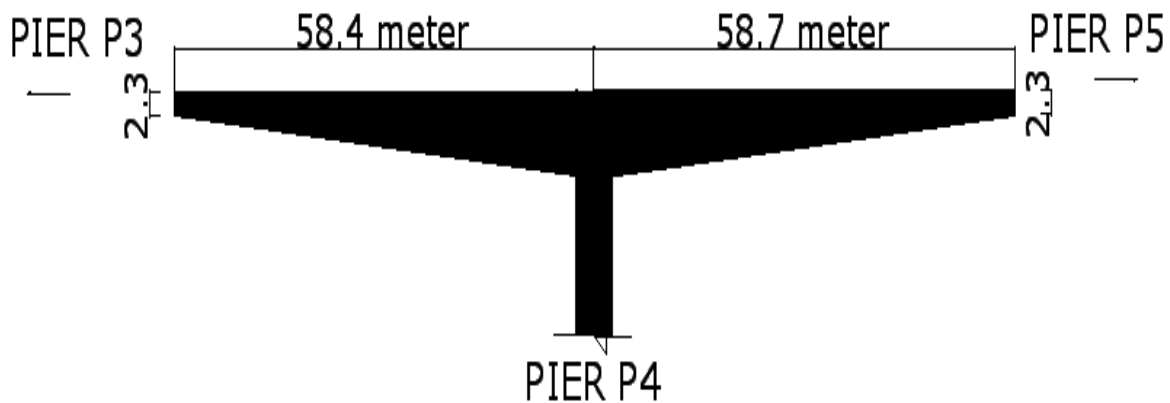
Elevation of pre-stressed balanced cantilever box girder P-4
